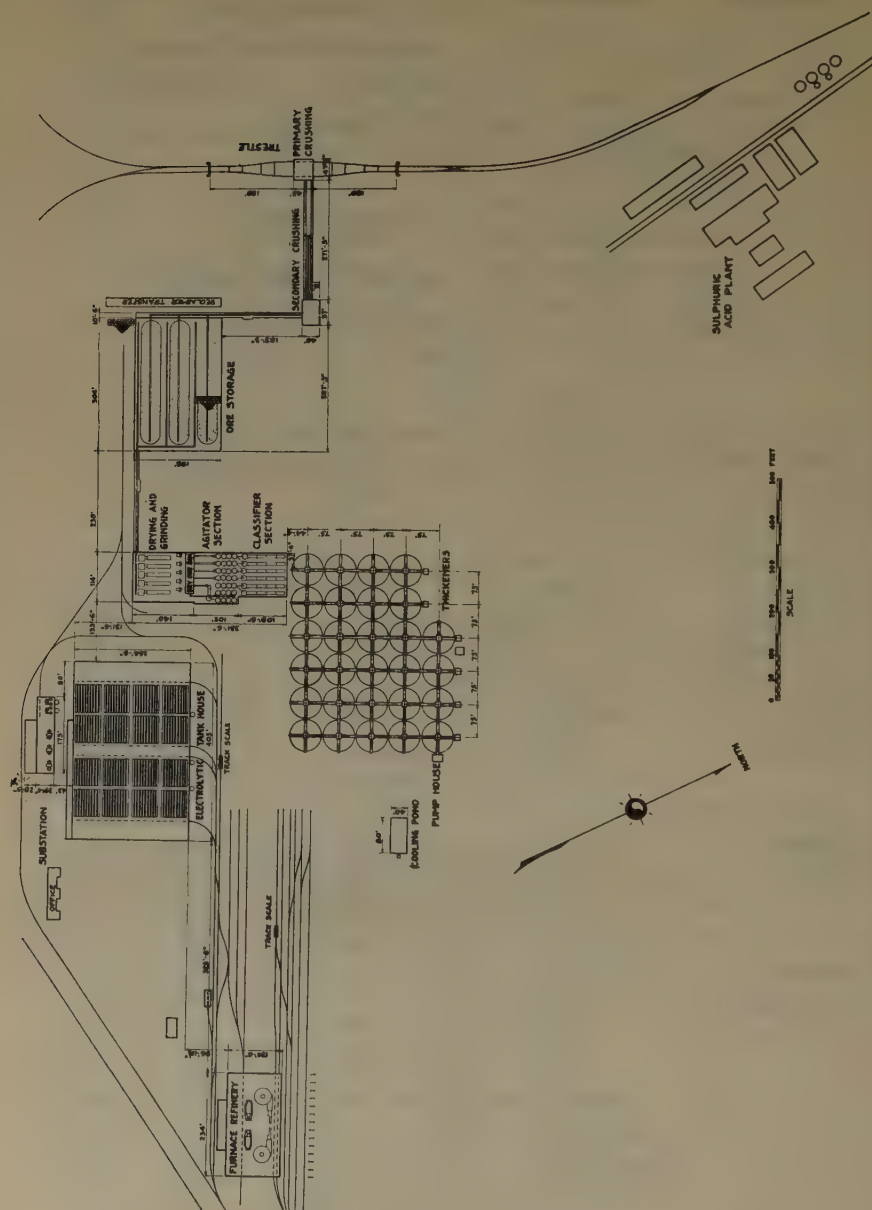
GENERAL PLAN OF 30,000-METRIC TON PANDA LEACHING PLANT.
